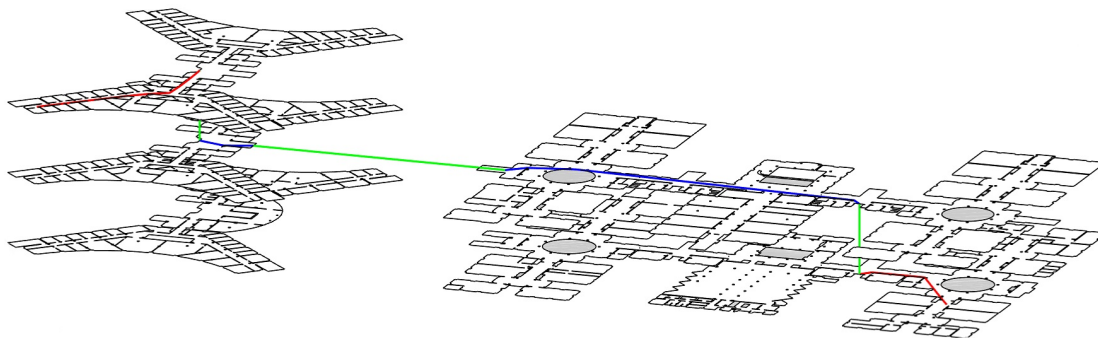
Shortest distance path between two endpoints located in distinct buildings and floors.
